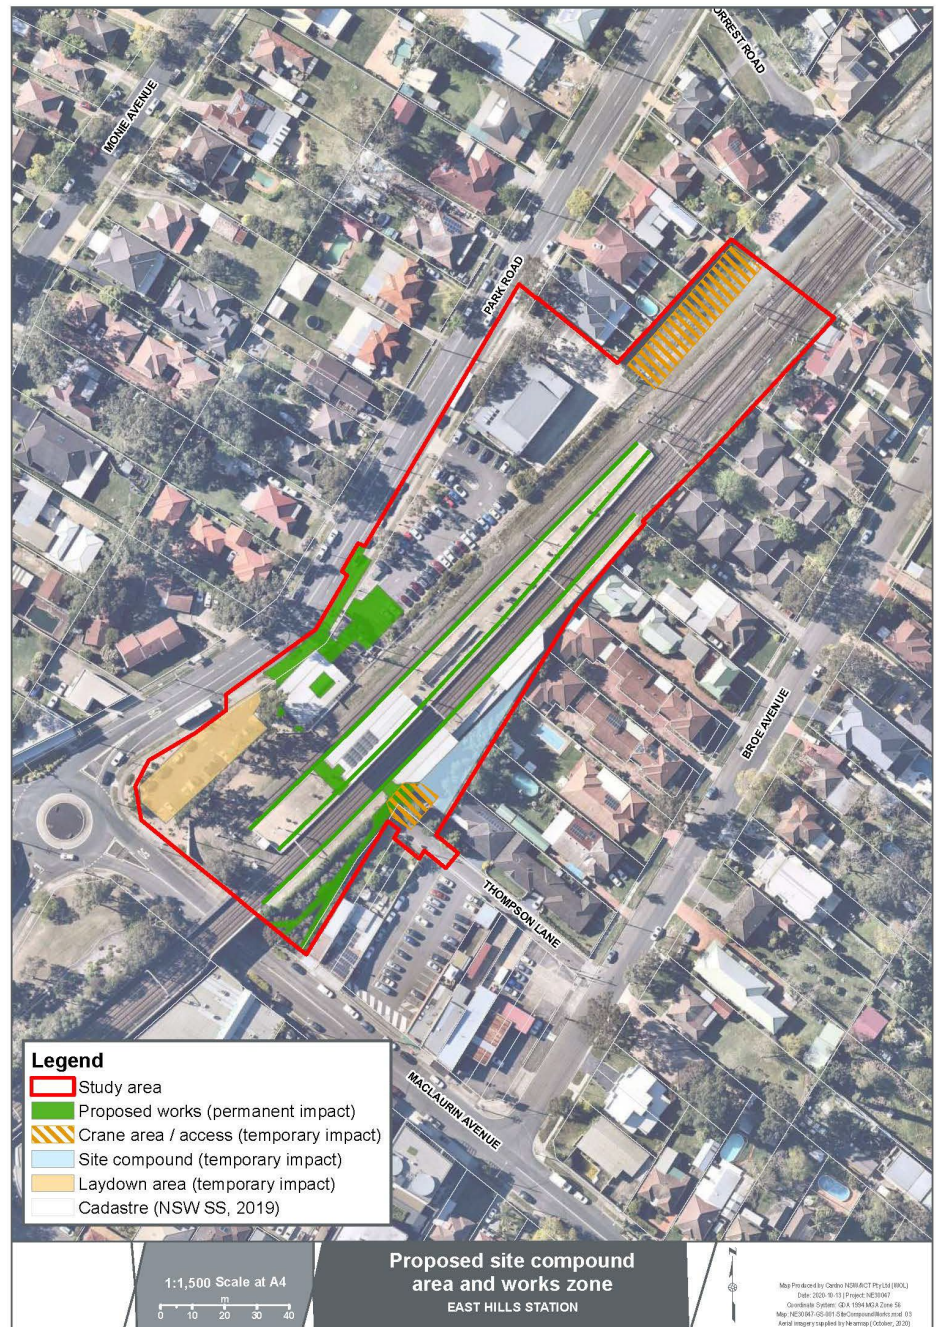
PROPOSED SITE COMPOUNDS AND WORK ZONE³
